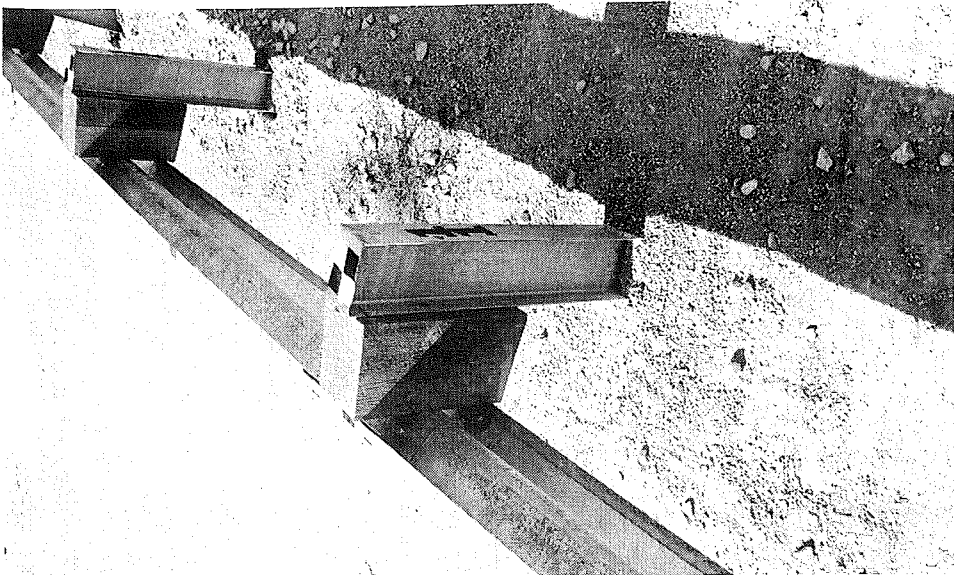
Type B Longitudinal Barrier Rail and Post Damage, Test MIW-1
